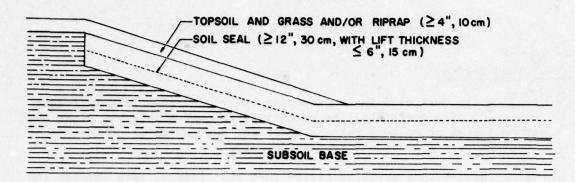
Cross-section of pond sealed with soil (Section 94.221)
